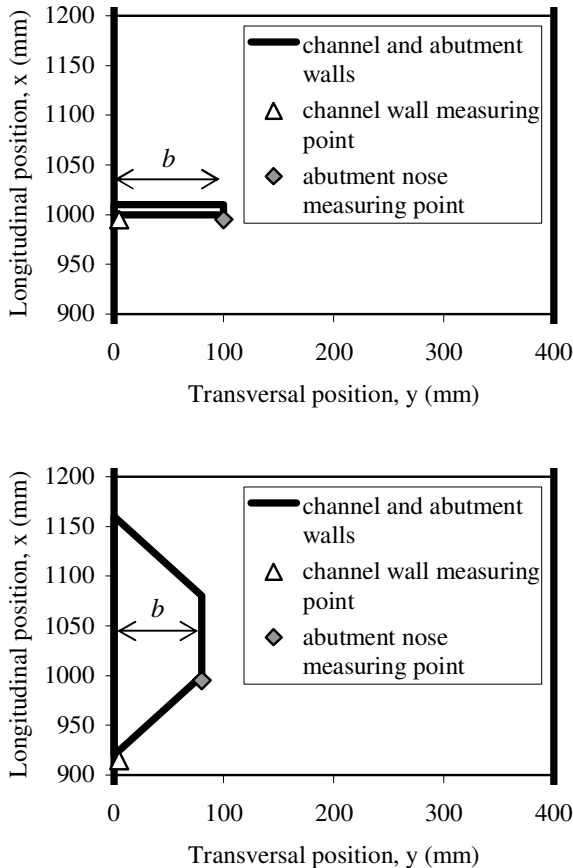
Definition sketch. Vertical wall (up) and 45° wing wall (down) abutments. Water flow is from bottom to top
